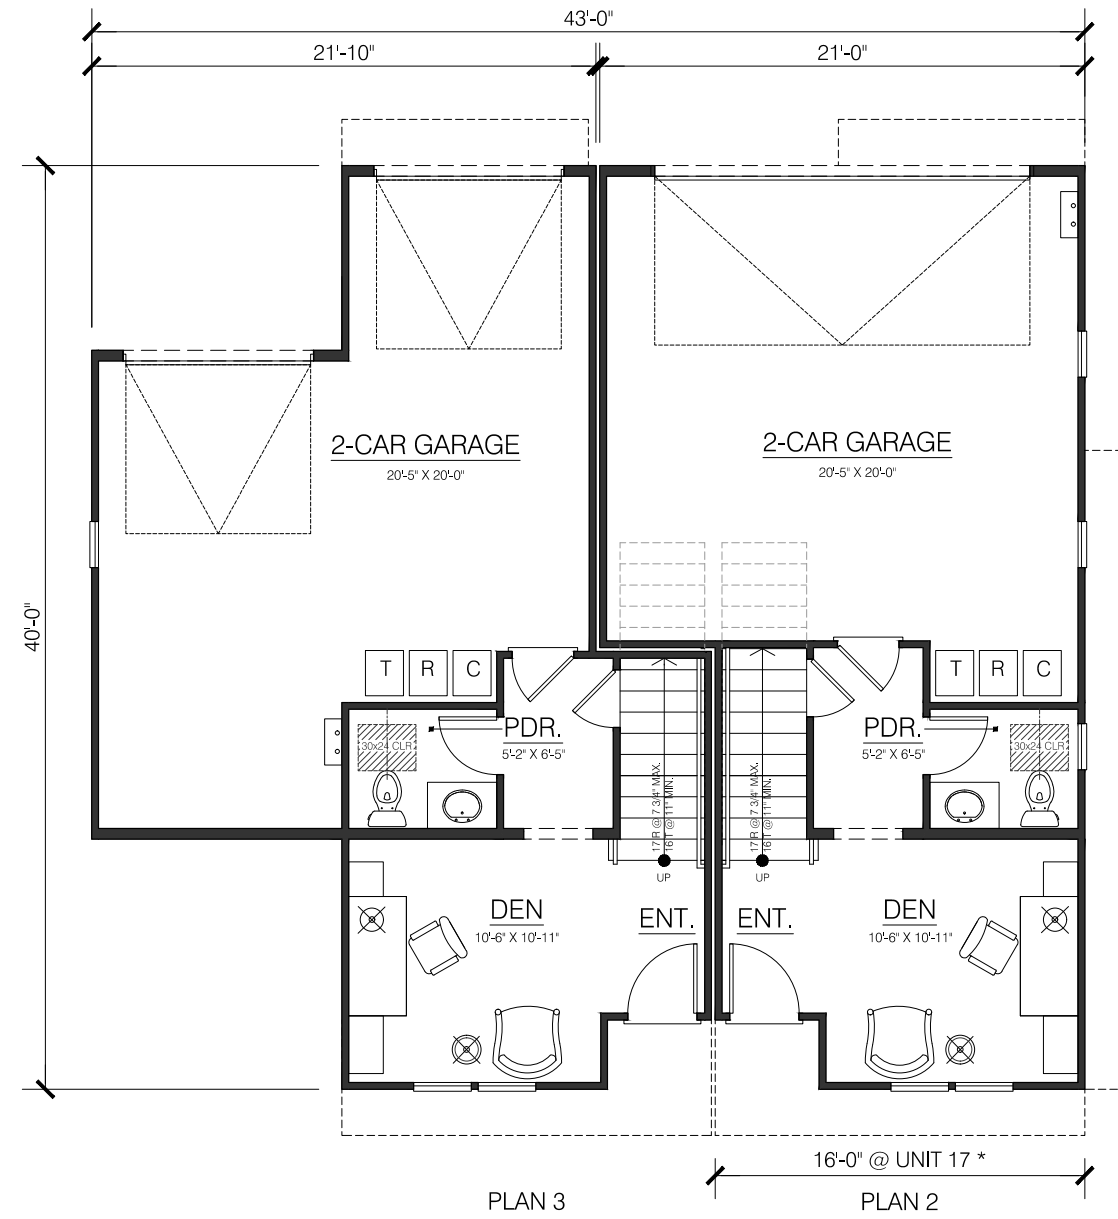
PLANS 2 AND 3 GROUND AND MAIN FLOOR
